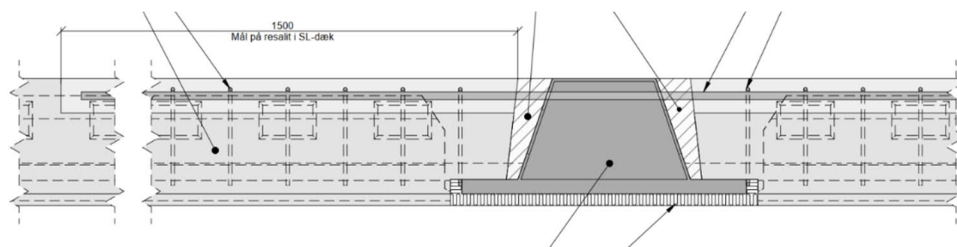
Delta beam connection (Abeo A/S, n.d.)
